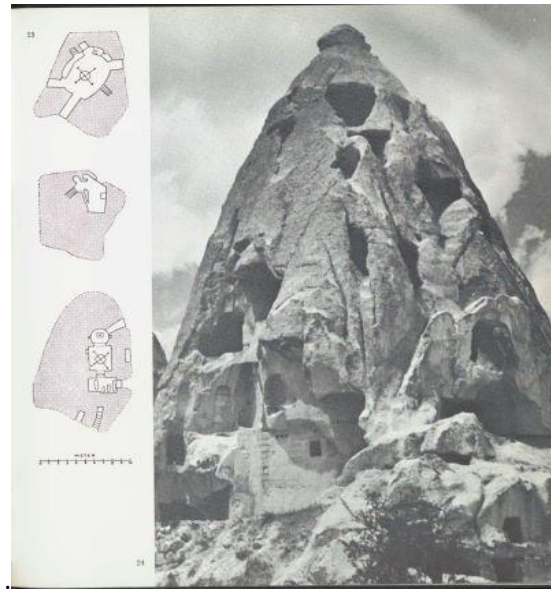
Plans of the apartment inhabited by Simeon the Stylite (in the fifth century a.d.) are shown at right. The lowest floor contained his oratory. Above it was his living quarters with a fireplace and furniture made from stone. Source: Architecture without Architects. Date: 1964.
